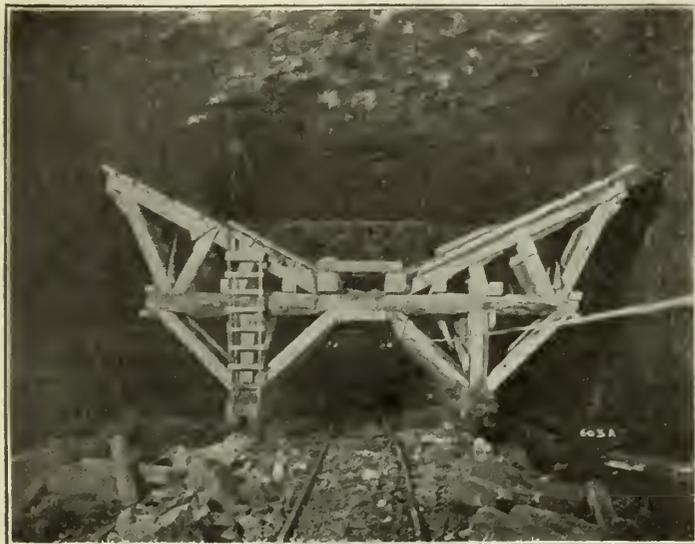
Travelling "Jumbo" for Roof Trimming.
